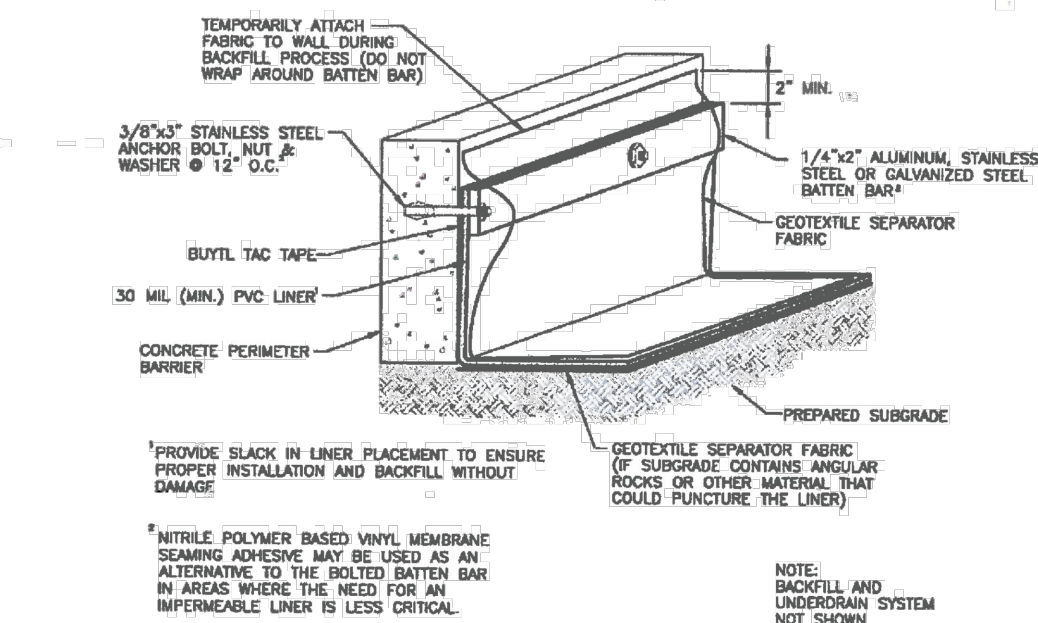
Geomembrane Liner/Concrete Connection Detail
